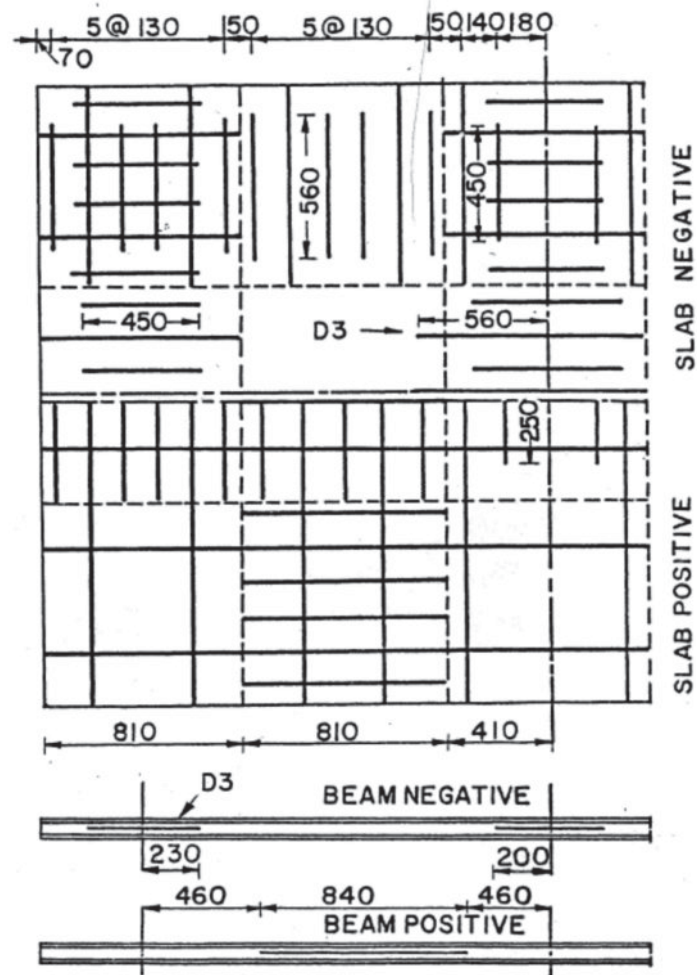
Rebar Details in Concrete slab and Beam (Nakashima, 1981)
